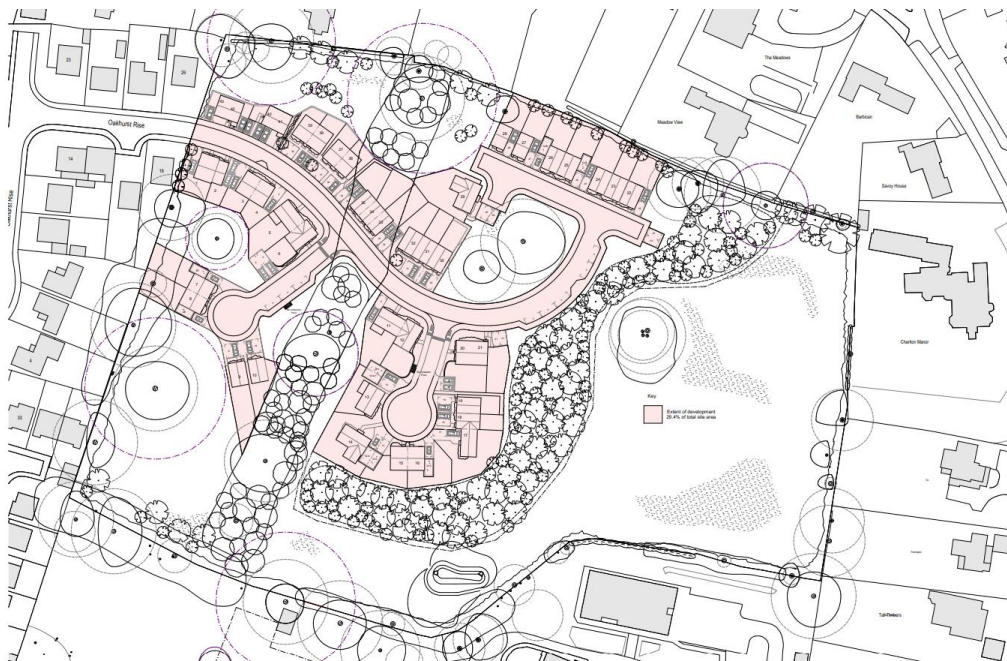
Architect's site layout drawing, showing the extent of the developed area as a proportion of the site as a whole
